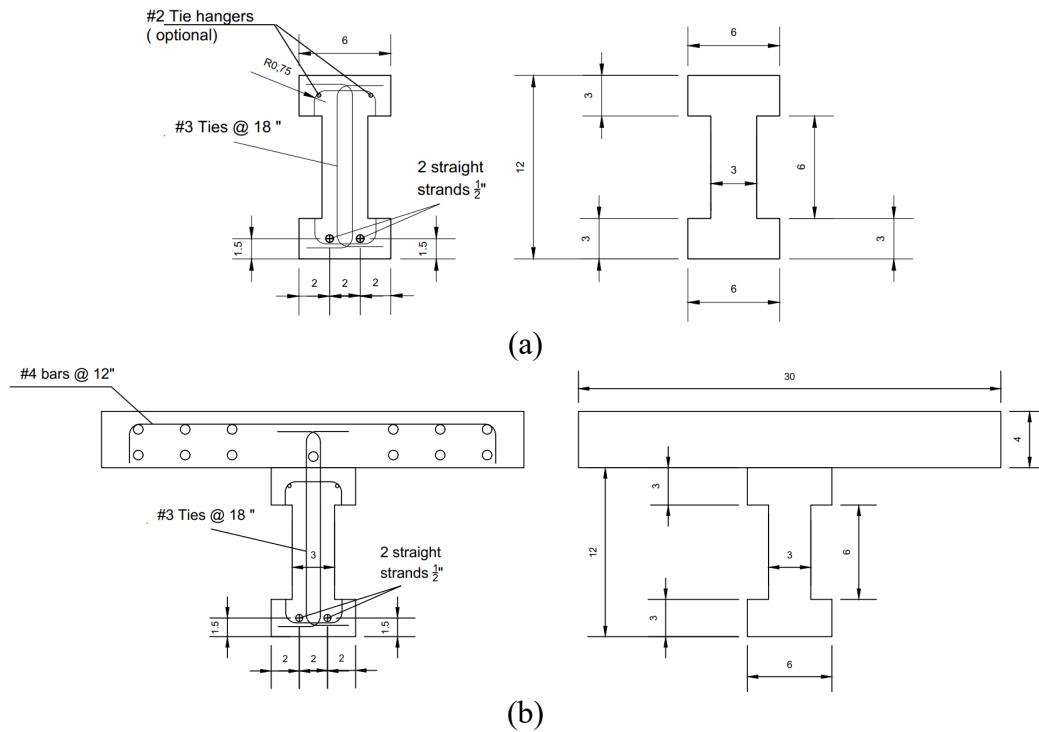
Cross section of tested specimens (a) Reinforcement details of Isolated beam, (b) Reinforcement details of T-beam
